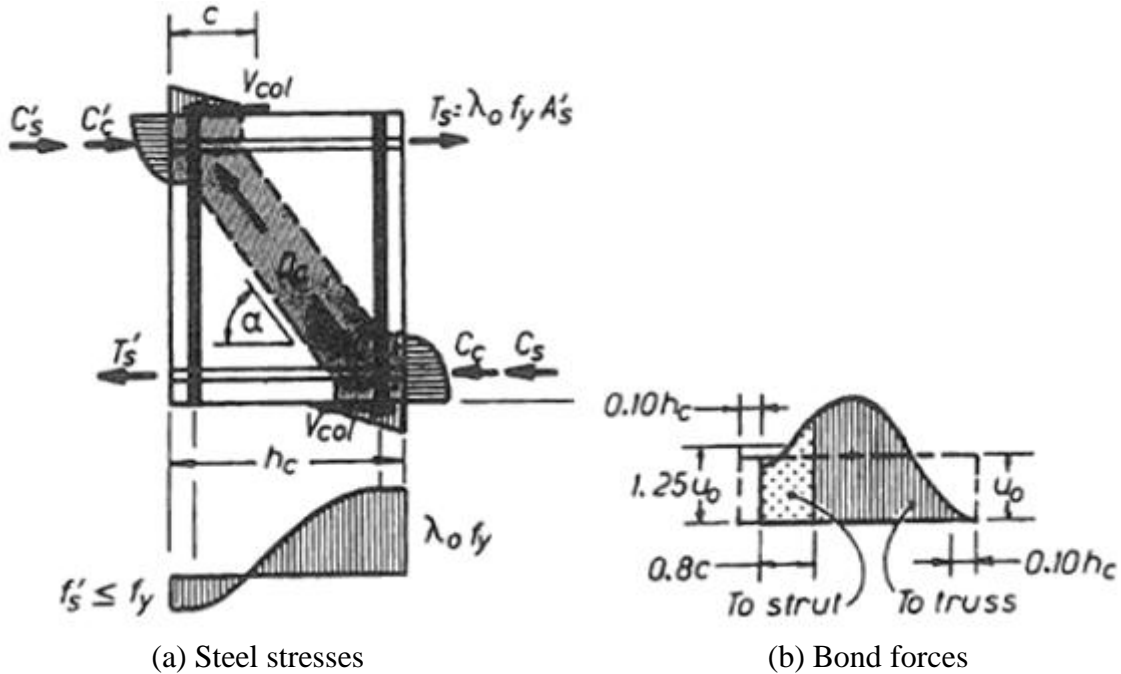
Concrete strut mechanism (Paulay & Priestley, 1992)
